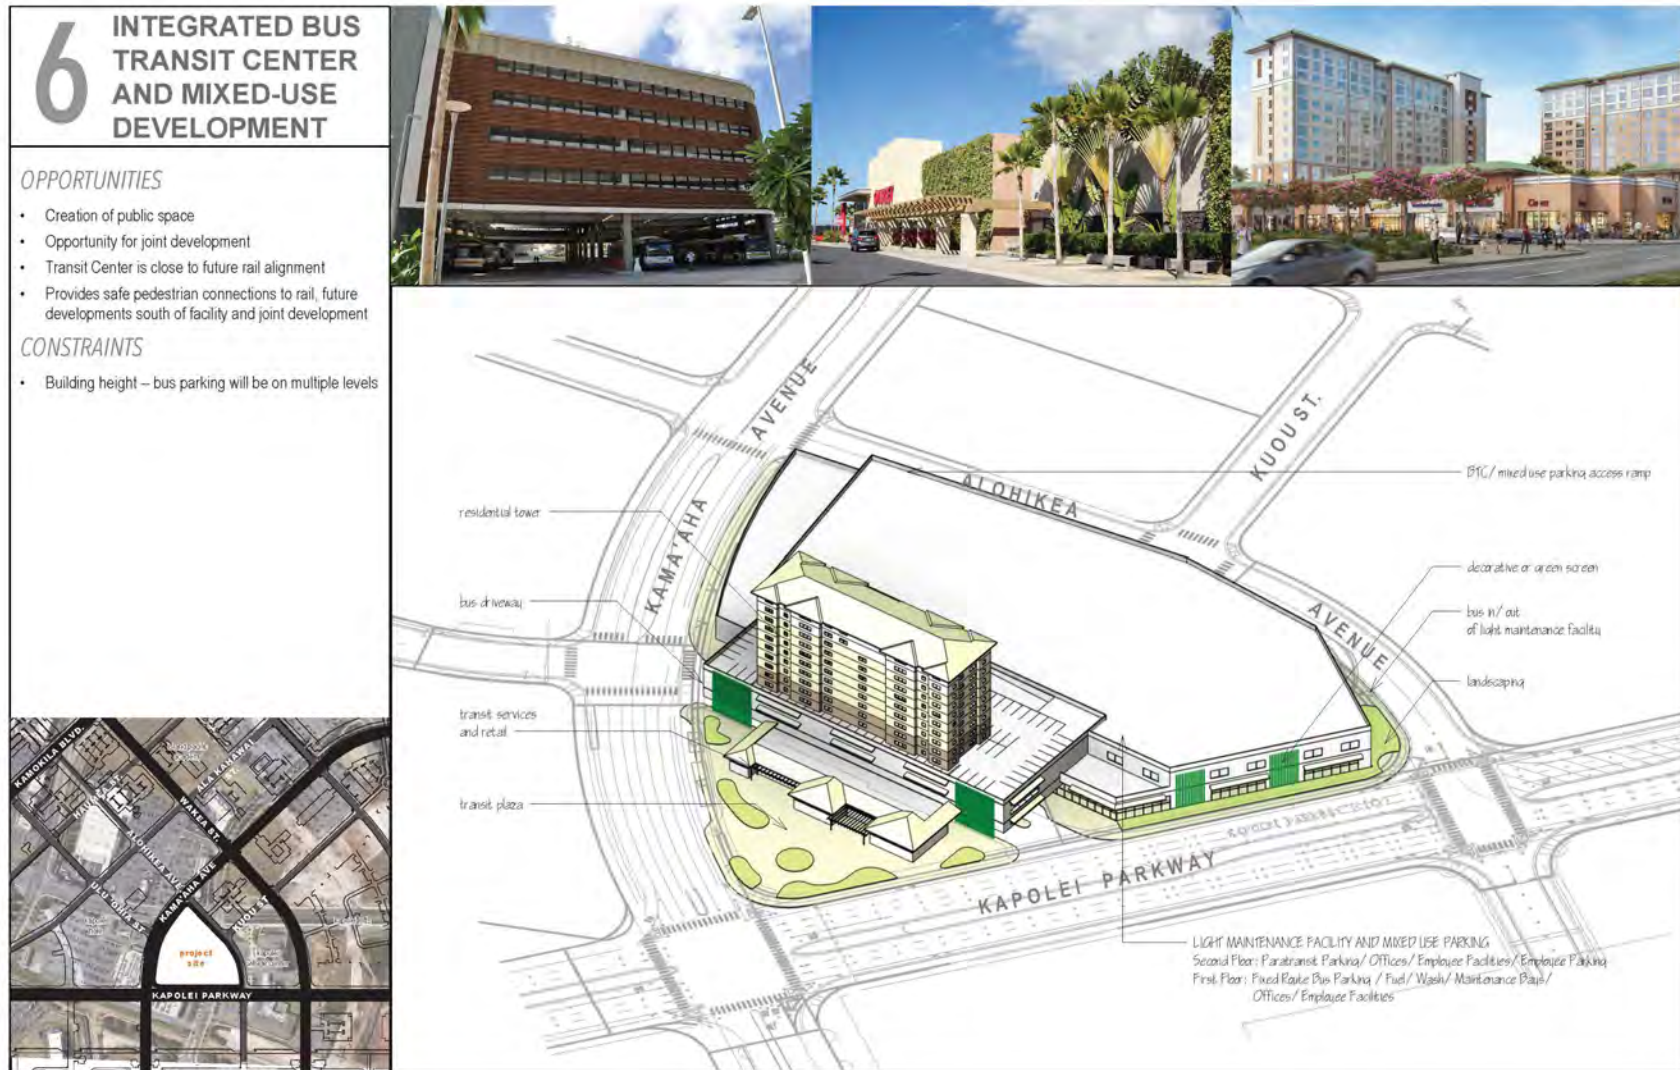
Site Plan and Floor Plans for Refined Option 6: Integrated Bus Transit Center and Mixed-Use Development
